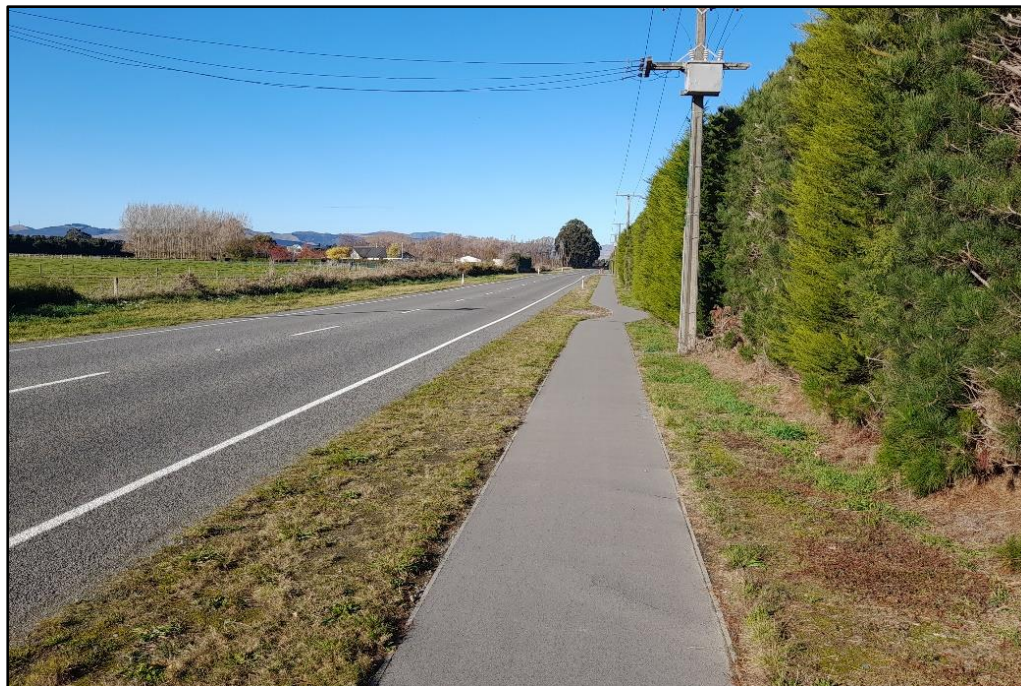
Rolleston to Lincoln Cycleway on Lincoln Rolleston Road
